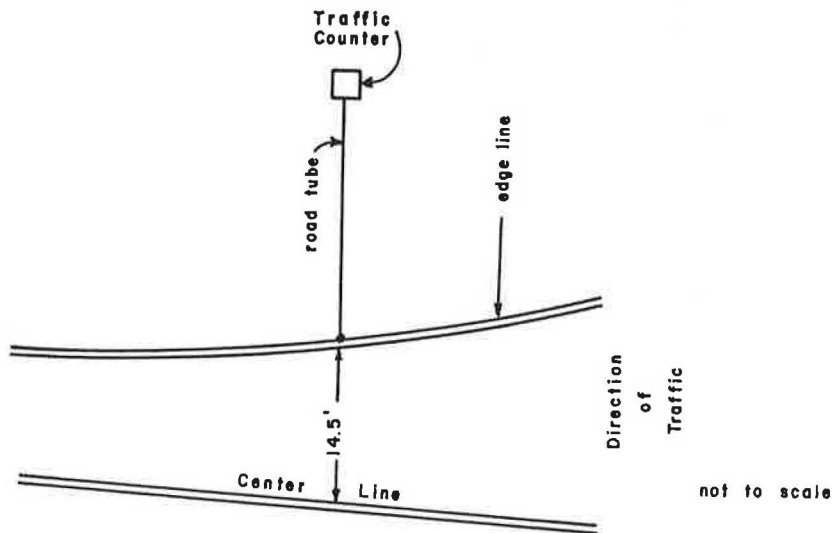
Road tube setup for end of passing zone encroachment study.
